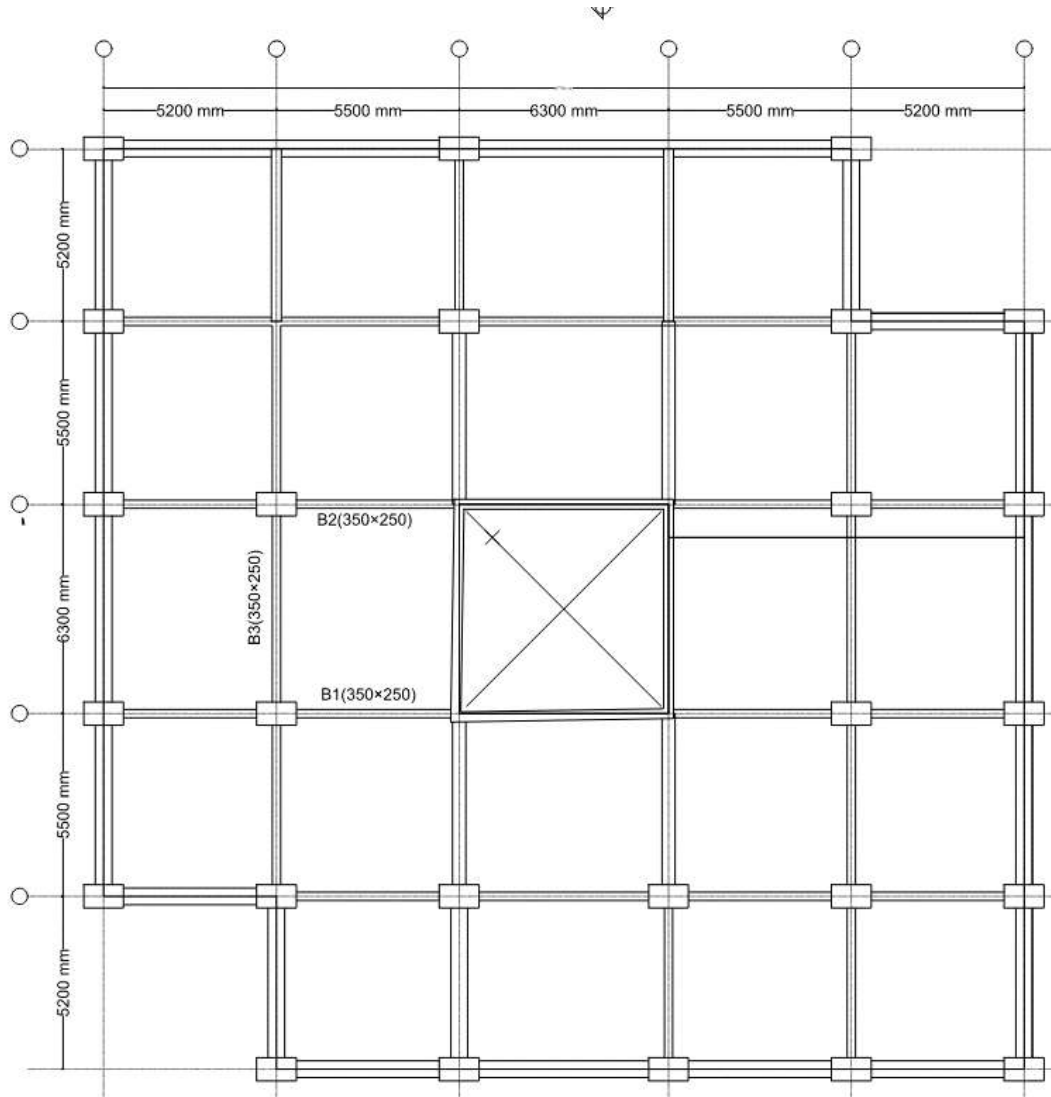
Showing Internal Beams of Conventional Floor (B1, B2, B3) Model (6.3-5.5-5.2).
